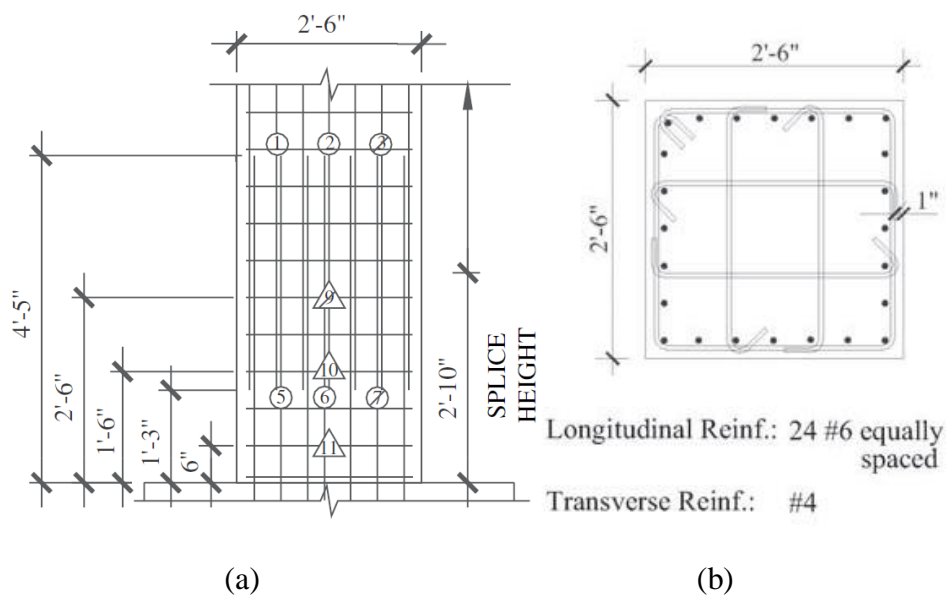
Dimensions and reinforcement details of column 3A (Williamson et al. 2010)
